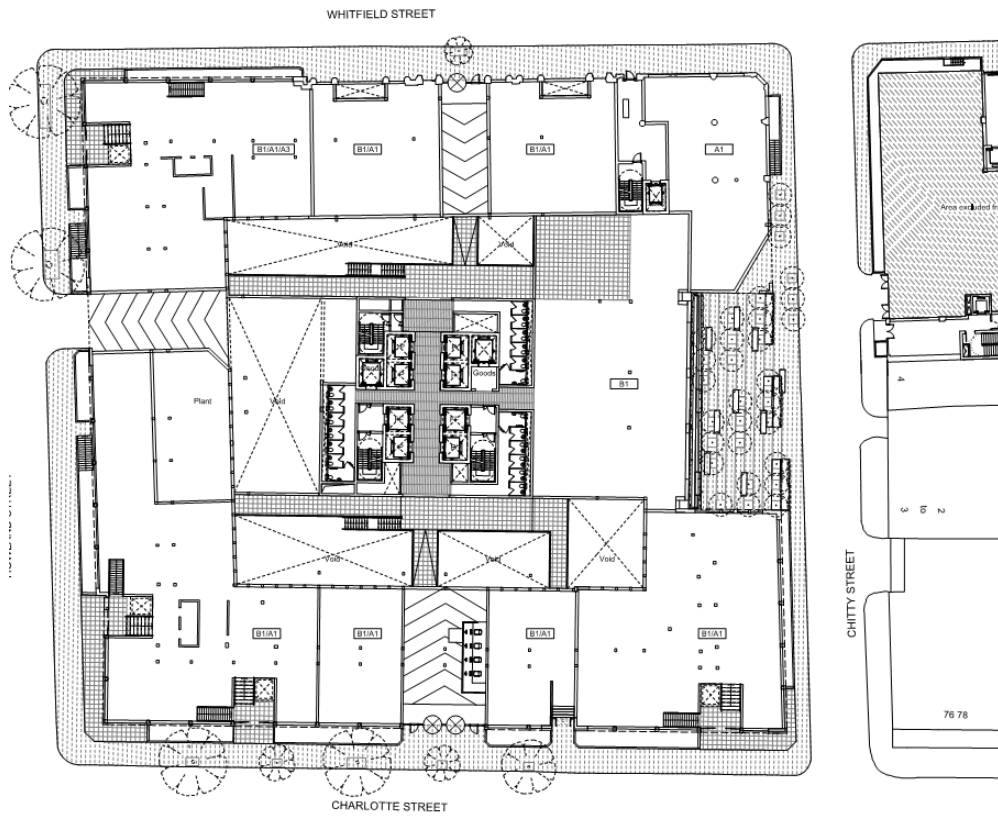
(Above) Ground floor plan approved under planning permission 2010/6873/P for 80 Charlotte Street
